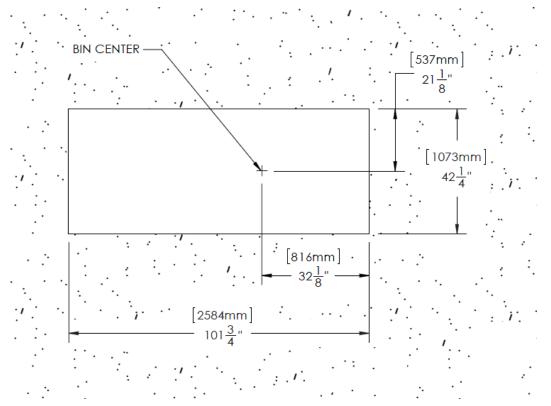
Formed Opening in Concrete Floor for Standard Center Sump
